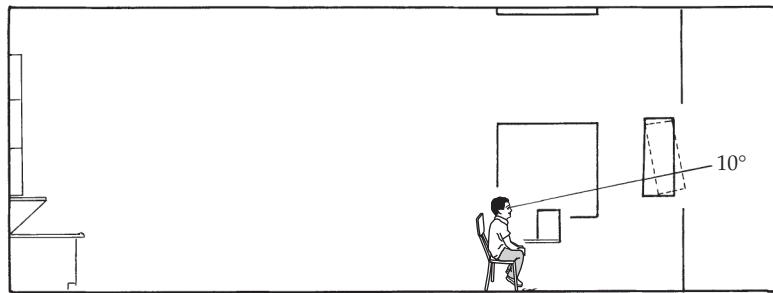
West elevation of a large postproduction room (Design Example 2) showing downward inclination of the monitors and ceiling absorber panel.
